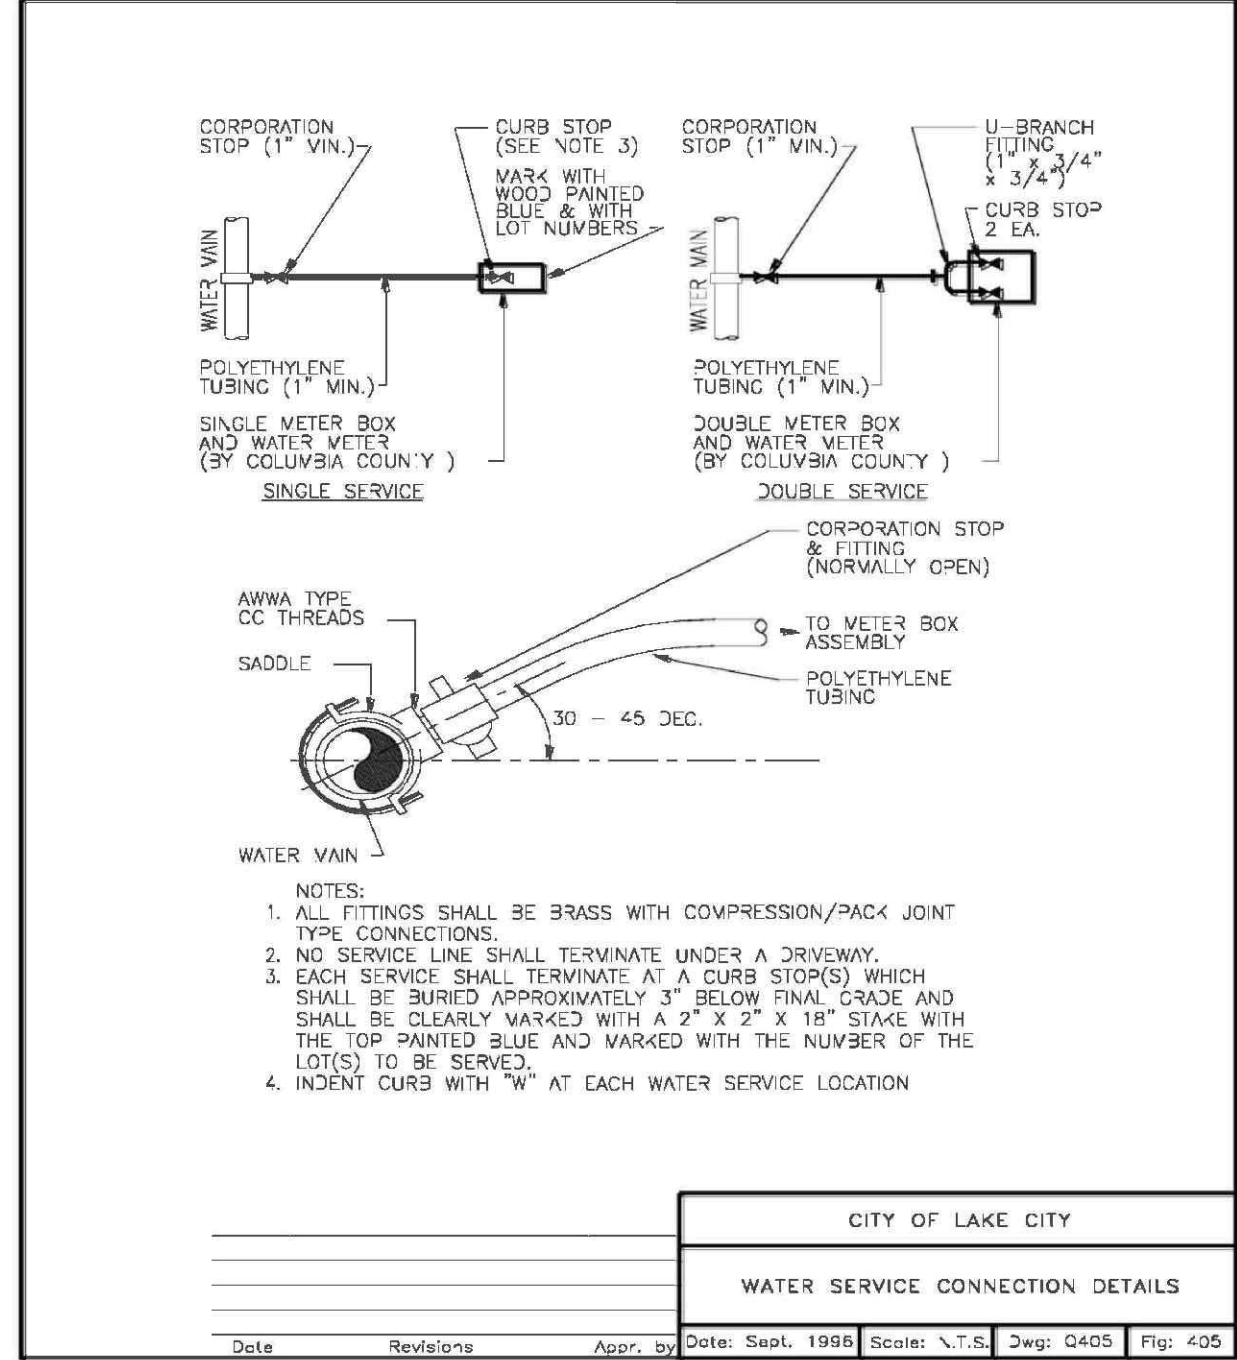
WATER SERVICE CONNECTION DETAILS
